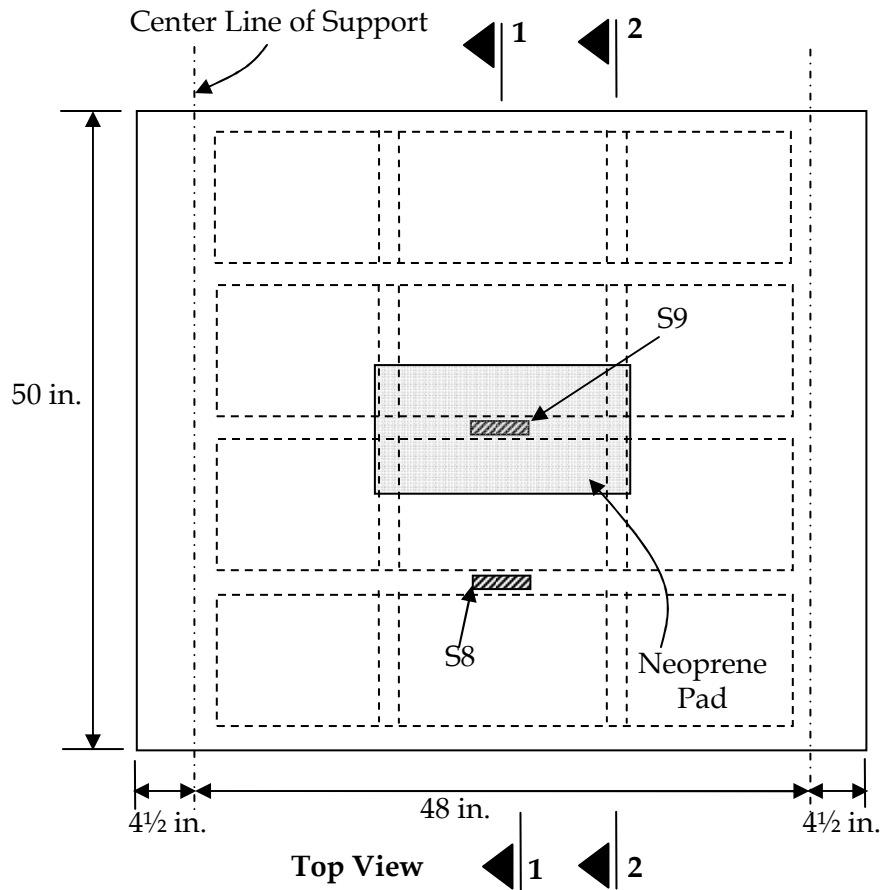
Instrumentation Plan and Loading Configuration for Specimen 4T1S
